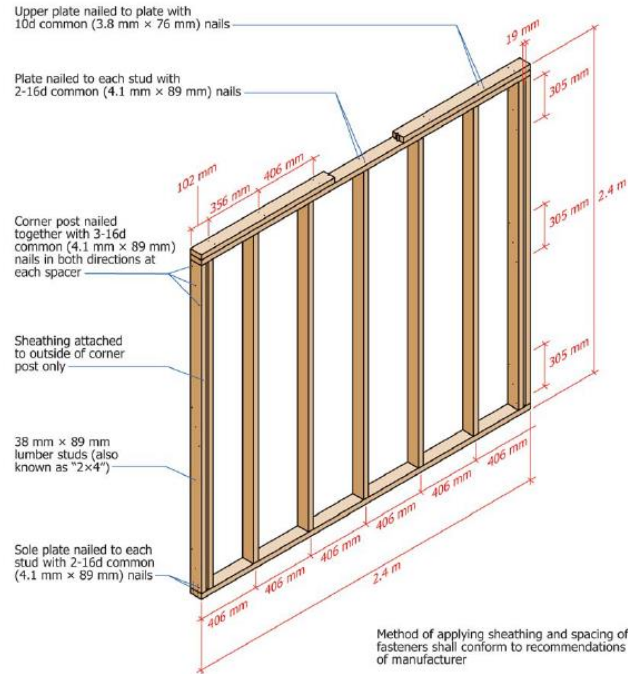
Standard Wood Frame (ASTM 72-14)
